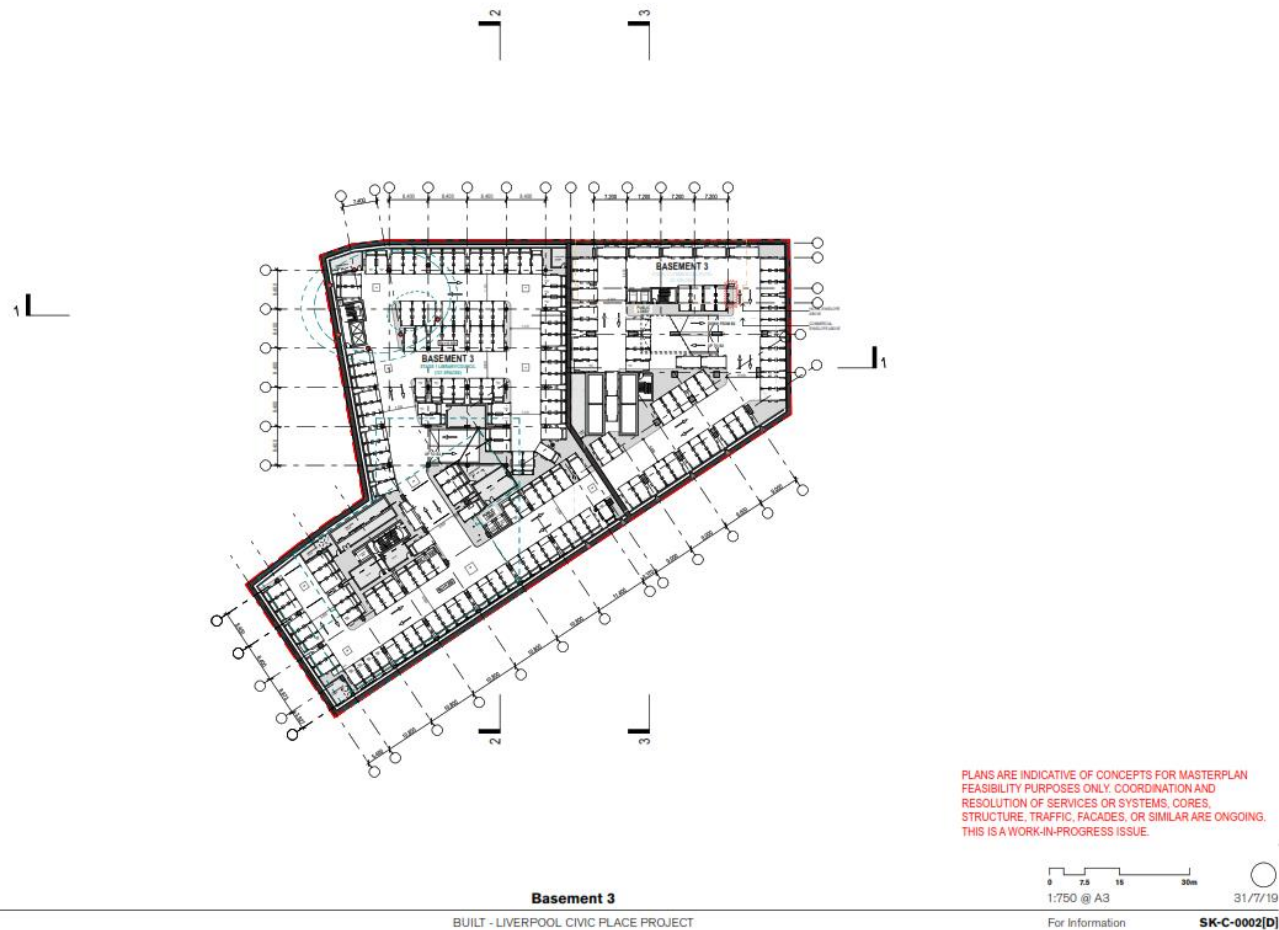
Lower basement level 3 of the proposed development. This plan illustrates how the basement car park will encompass the entire footprint of the site. (Source: Built).
